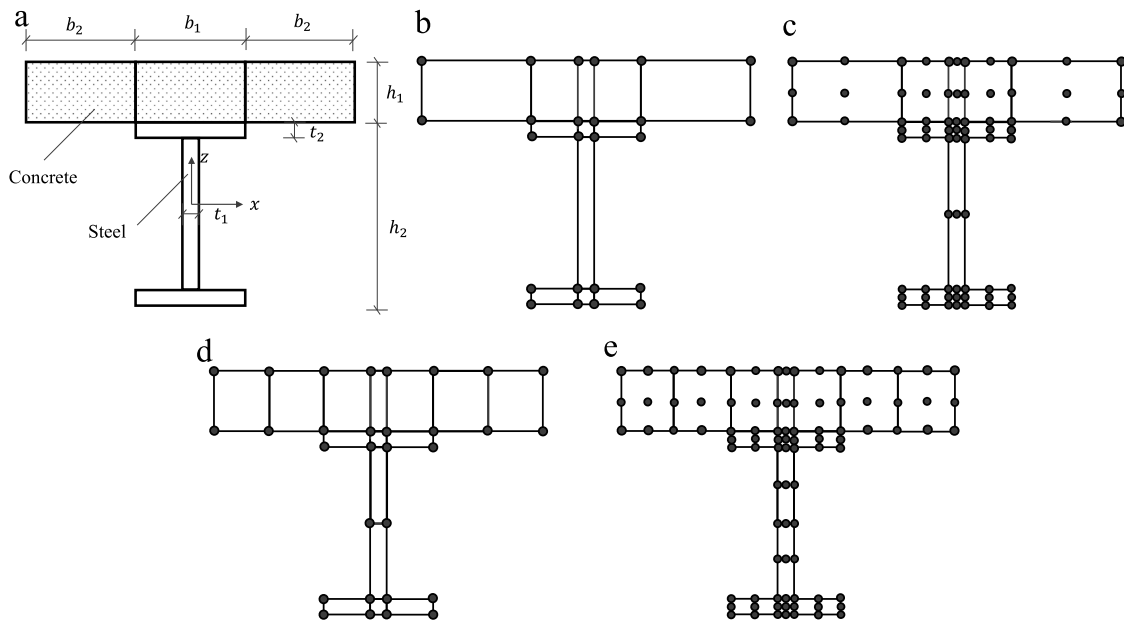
I-girder cross-section and LE discretizations. (a) I-girder cross-section; (b) 12L4; (c) 12L9; (d) 15L4; (e) 15L9.
